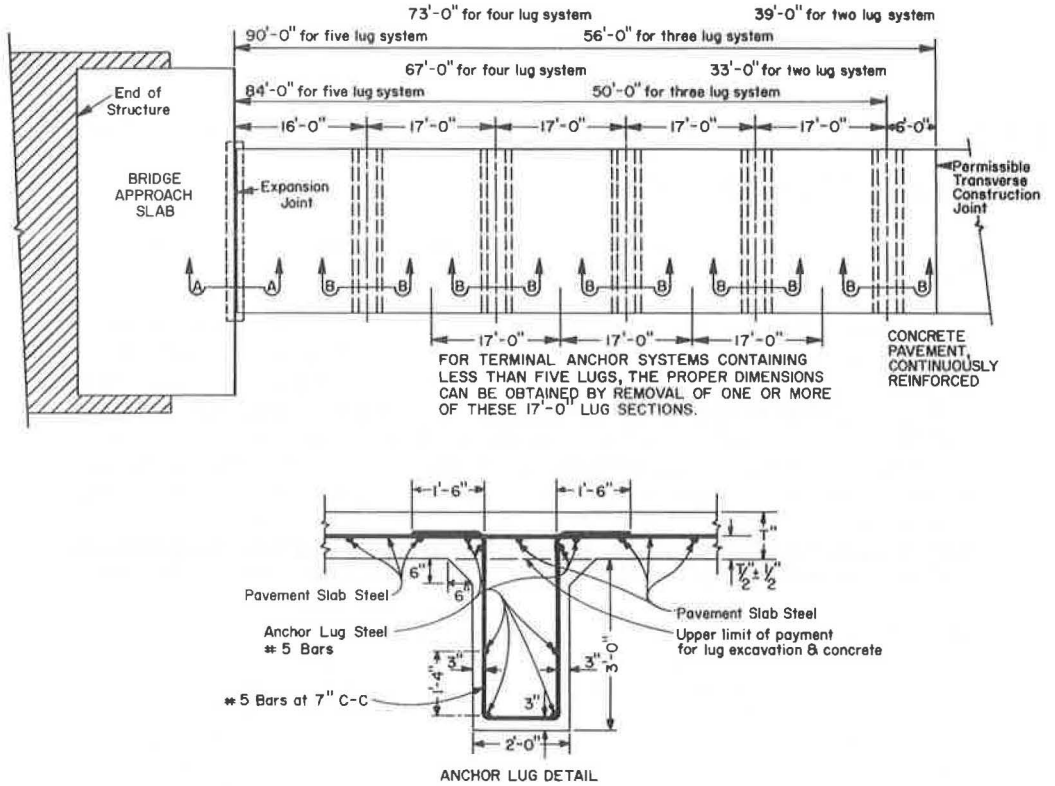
Typical lug design of continuously reinforced concrete pavement.
